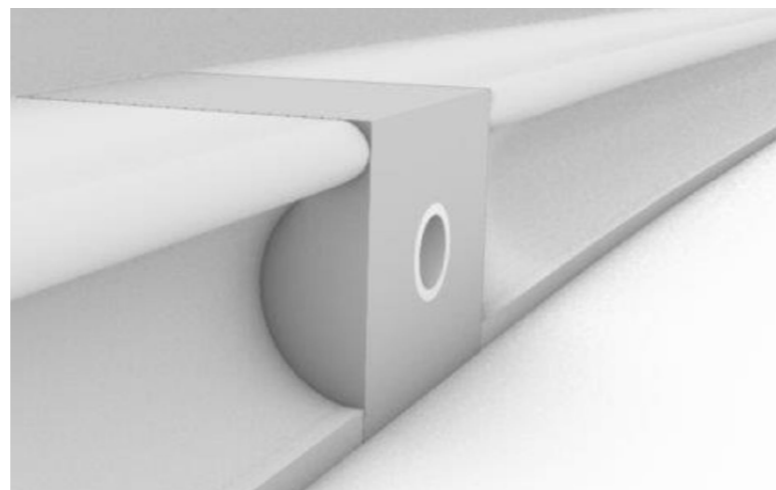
Indicative stormwater outfall penetration through seawall.
